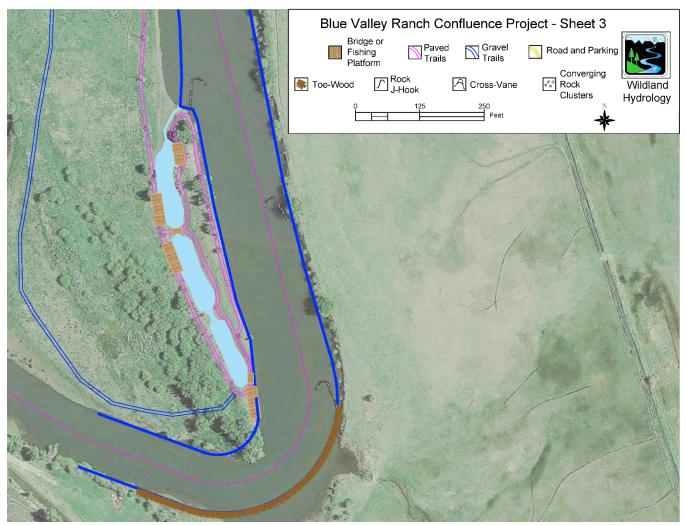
Design Sheet 3 showing the proposed structure locations, trail system, and oxbow channel system.
